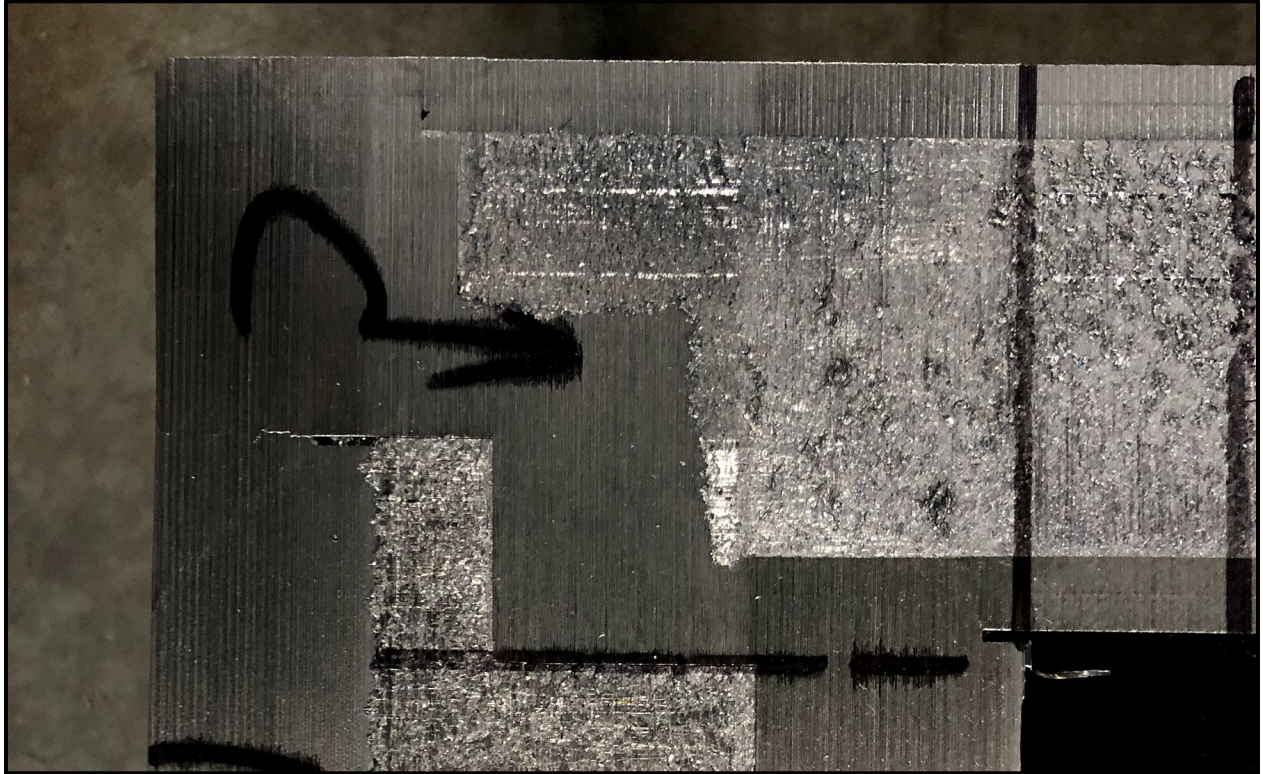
SC-30G3 18TU-04 Destructive Disassembly Cut C at Lower Flange
